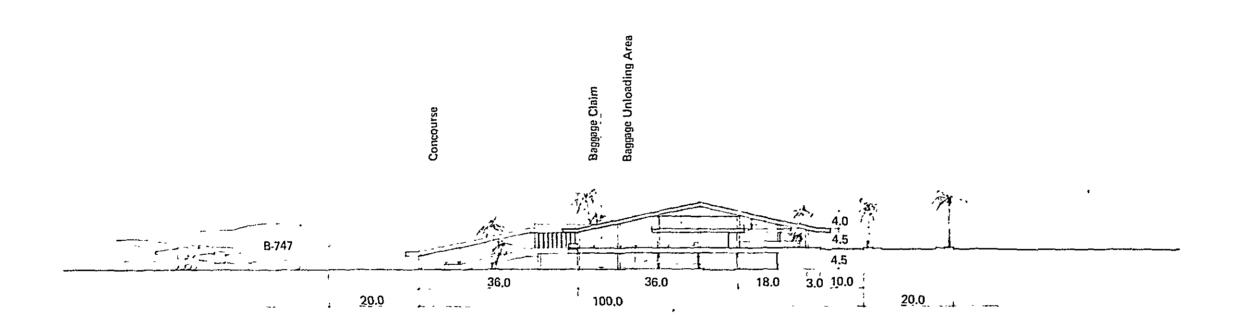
Proposed International Airport Terminal Building Section
